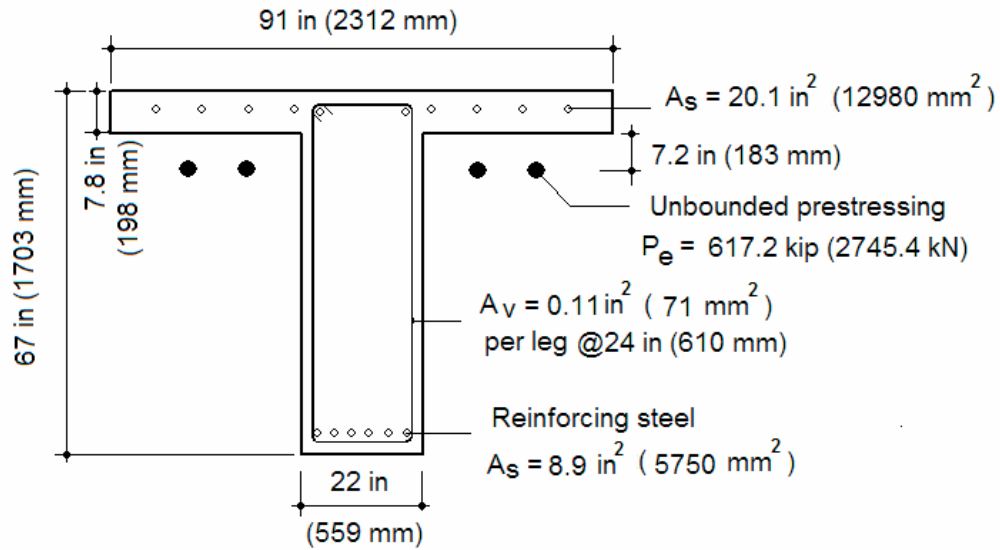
Cross-section of the evaluated bridge girder example at 4.67 m from mid-support ($M_u = -2628$ kNm, $V_u = 662.4$ kN).
